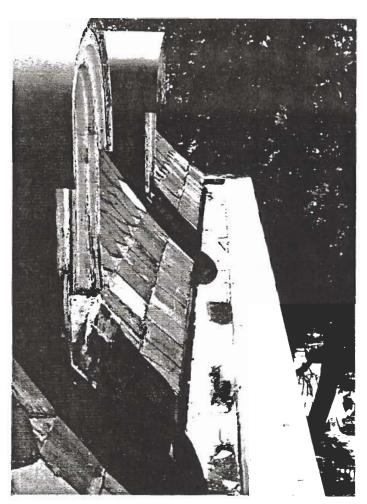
West Elevation at Mansard Roof and Integral Copper Gutter showing Circleheaded Dormers.
